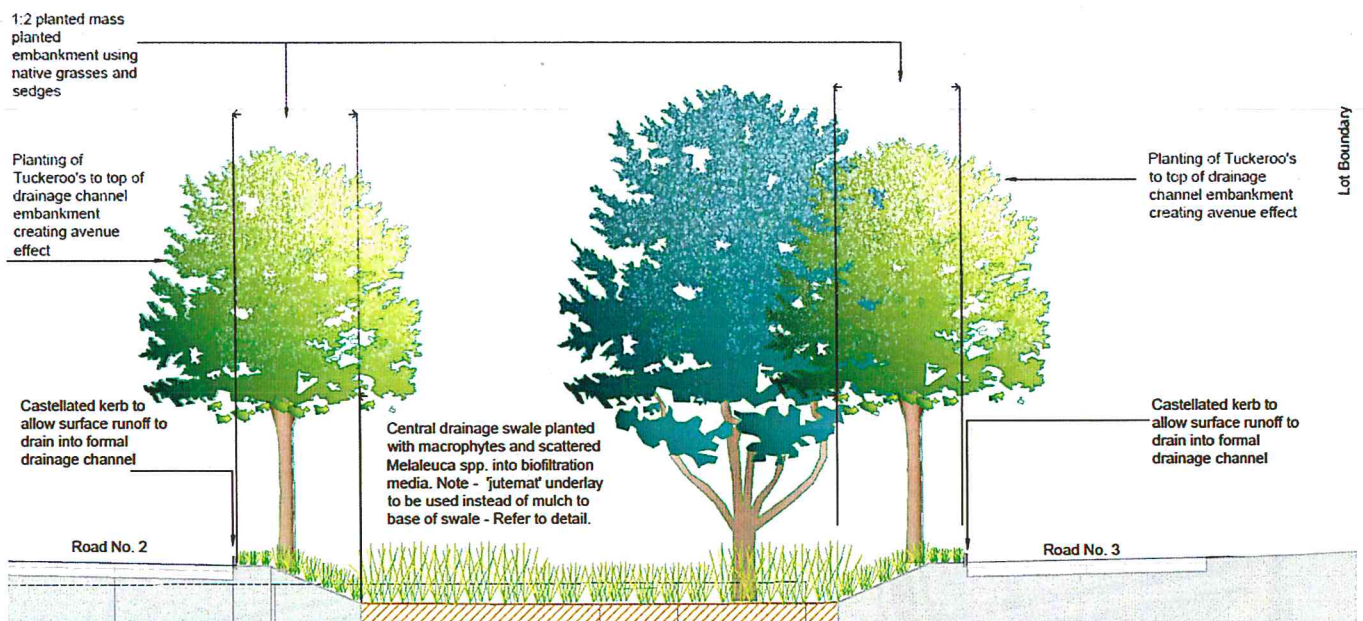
Cross-section View – Central Open Swale (source: LDA)
